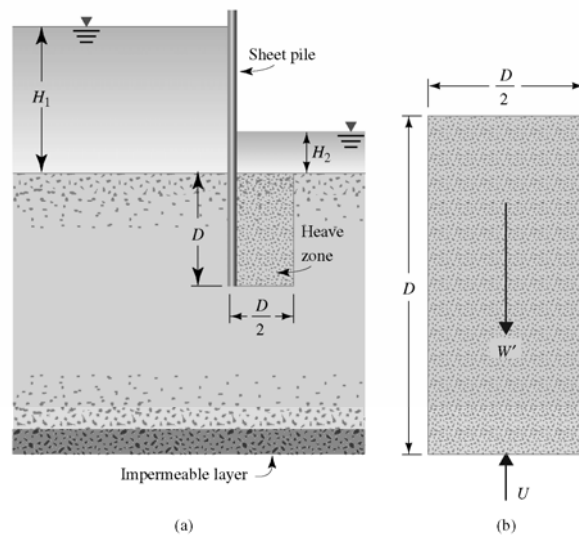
(a) Check for heaving on the downstream side for a row of sheet piles driven into a permeable layer; (b) enlargement of heave zone
